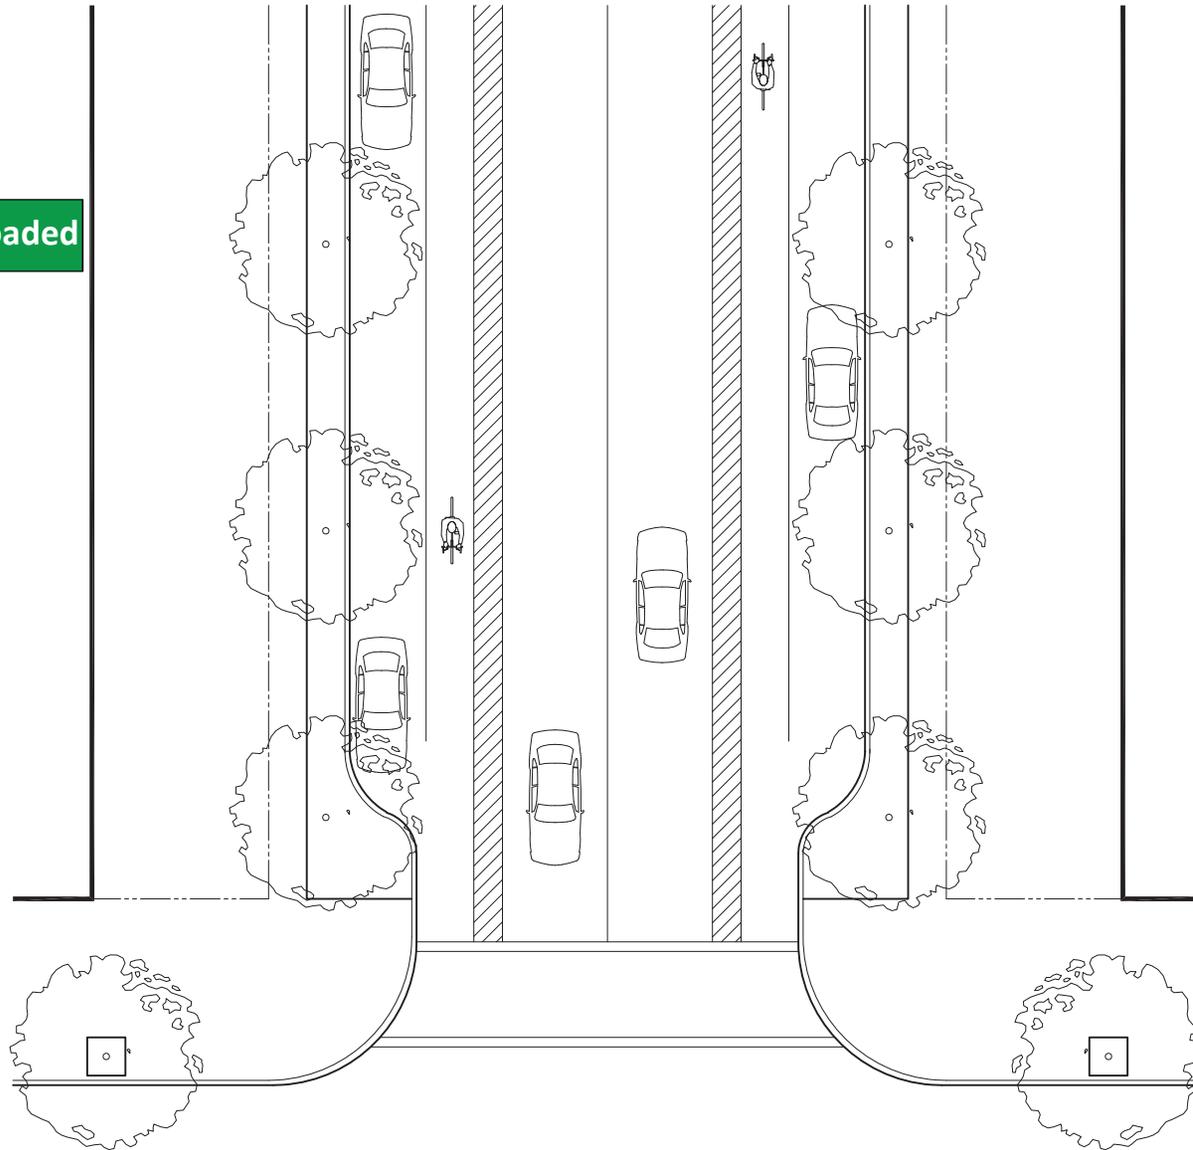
Street Type 10.2: Typical Intersection (Plan View)
